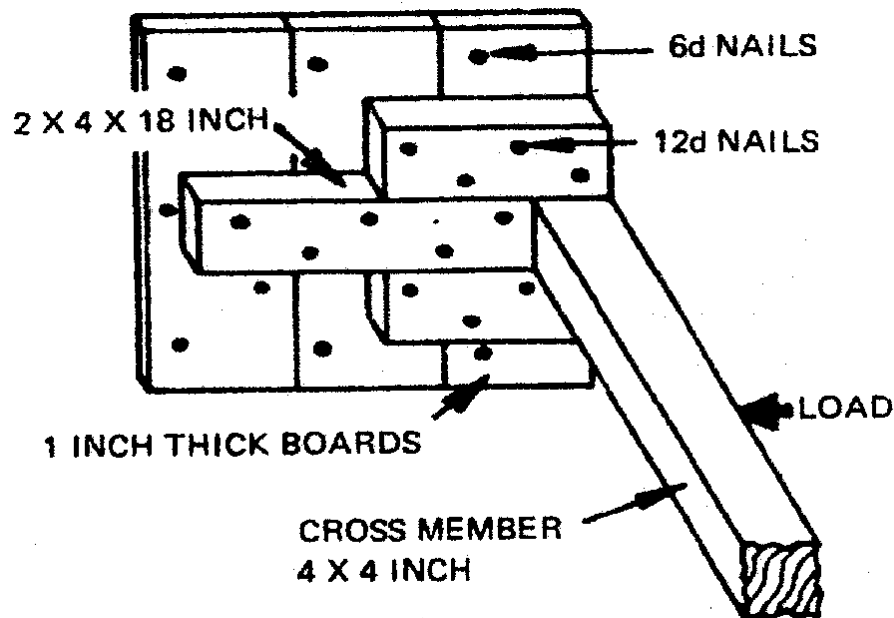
Nailing cleats to side walls using supplemental 1-inch lining boards.
